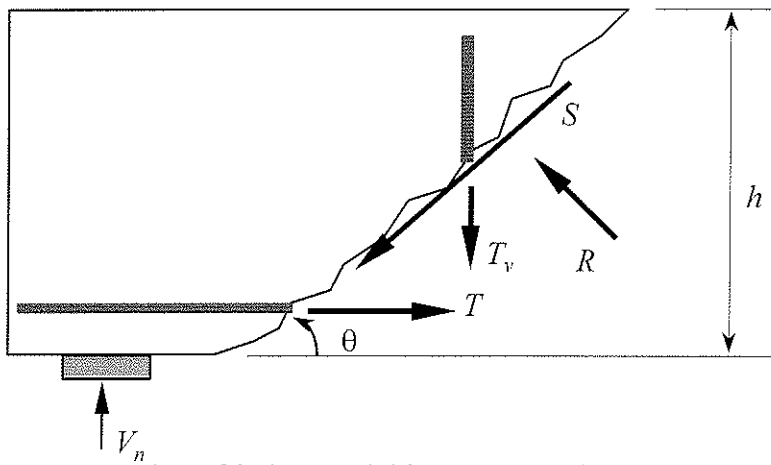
Shear friction model in a concrete beam (Loov 1998)
